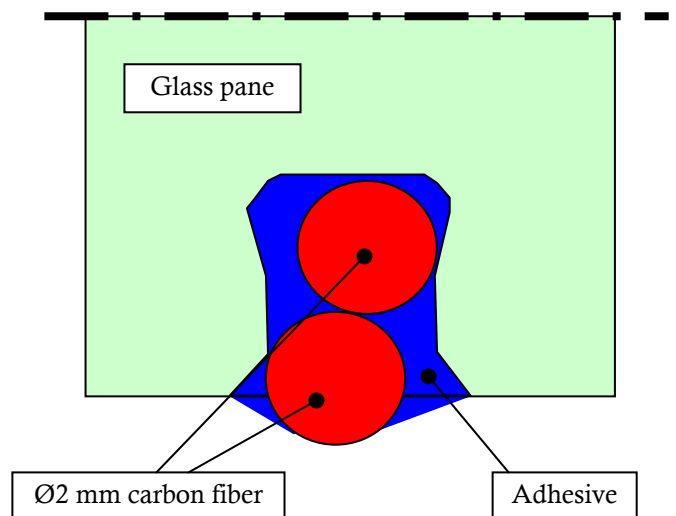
, Close-up of bottom of girder cross-section with reinforcement geometry for specimen 1.
